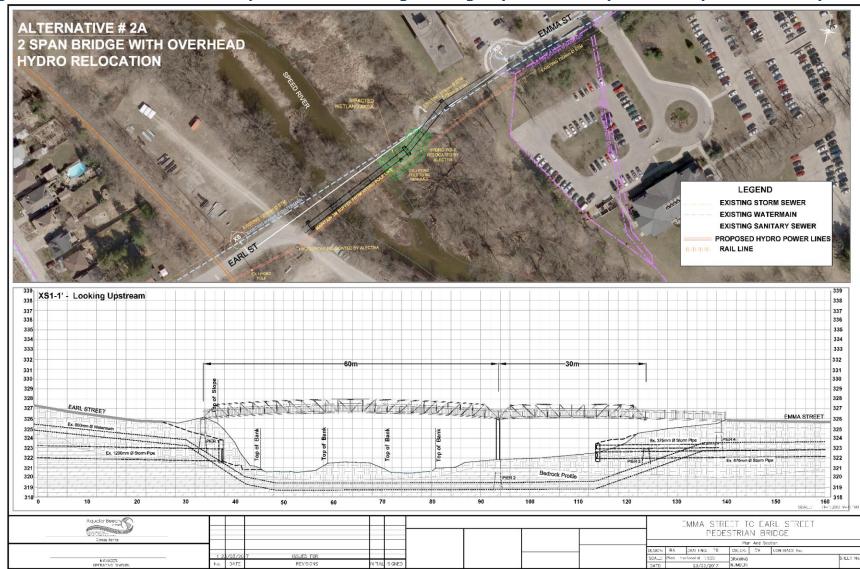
Alternative 2a: Double Span Steel Truss Bridge Through Hydro Corridor (Overhead Hydro Relocation)
